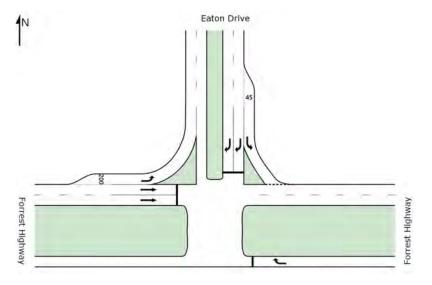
Concept Layout for the Eaton Drive / Forrest Highway Intersection
